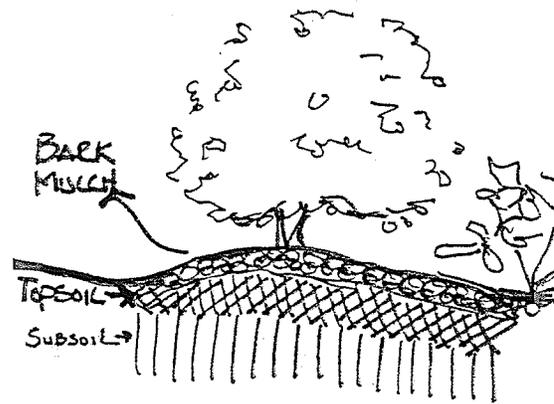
Section of bark mulch on planting bed, M. Mitchell
